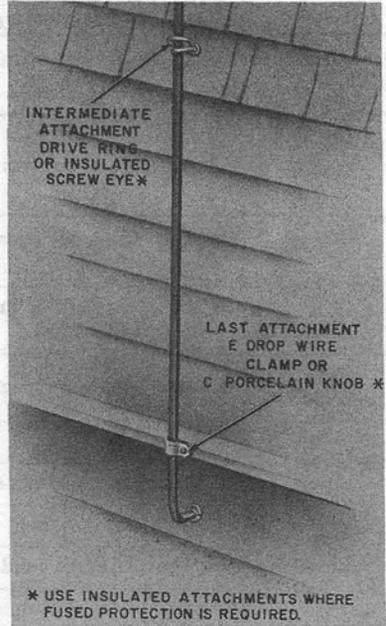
Crossing Wood or Stucco on Wood Building Projection
